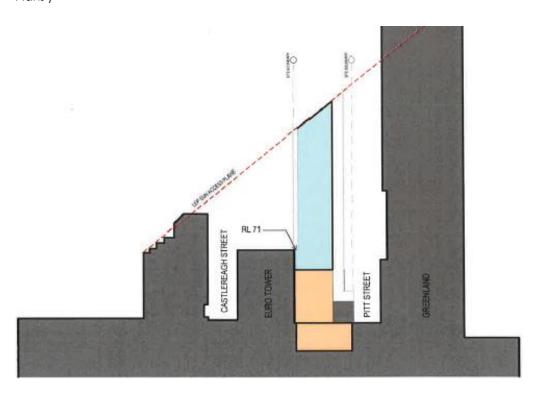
Pitt Street South Concept SSD DA - East West Section (Source: SSD 8876 Concept Stamped Plans)
